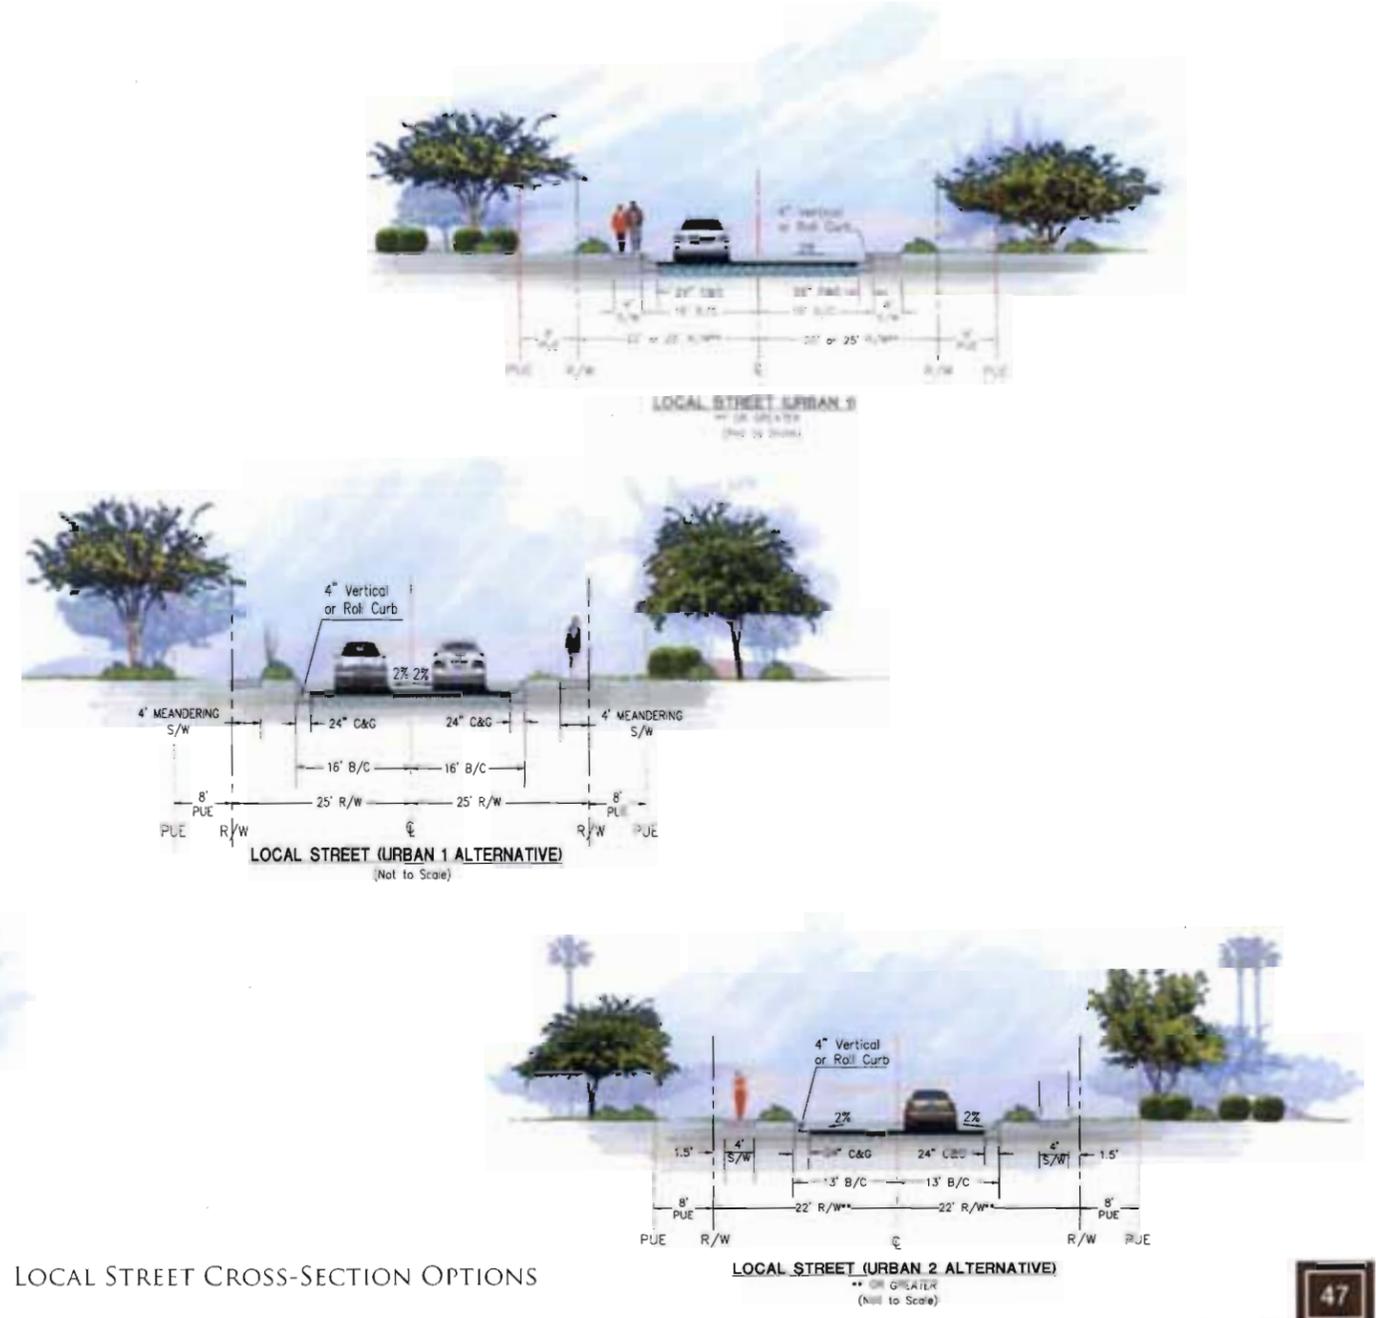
LOCAL STREET CROSS-SECTION OPTIONS
